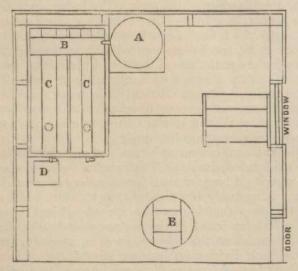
GROUND PLAN OF EXTRACTING-HOUSE.
